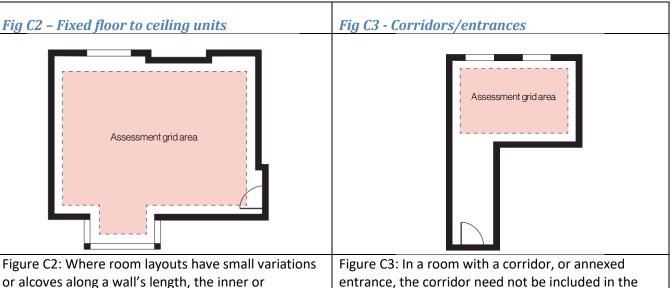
Where room layouts have small variations or alcoves along a wall's length, the inner or dominant section should be taken as a basis for the 0.3m gap to the assessment grid area. Fixed floor to ceiling cupboards can be excluded from the room area, but not kitchen units incorporating a worktop. Areas in bay windows may be included unless they are winter gardens separated from the room by a fixed partition.
